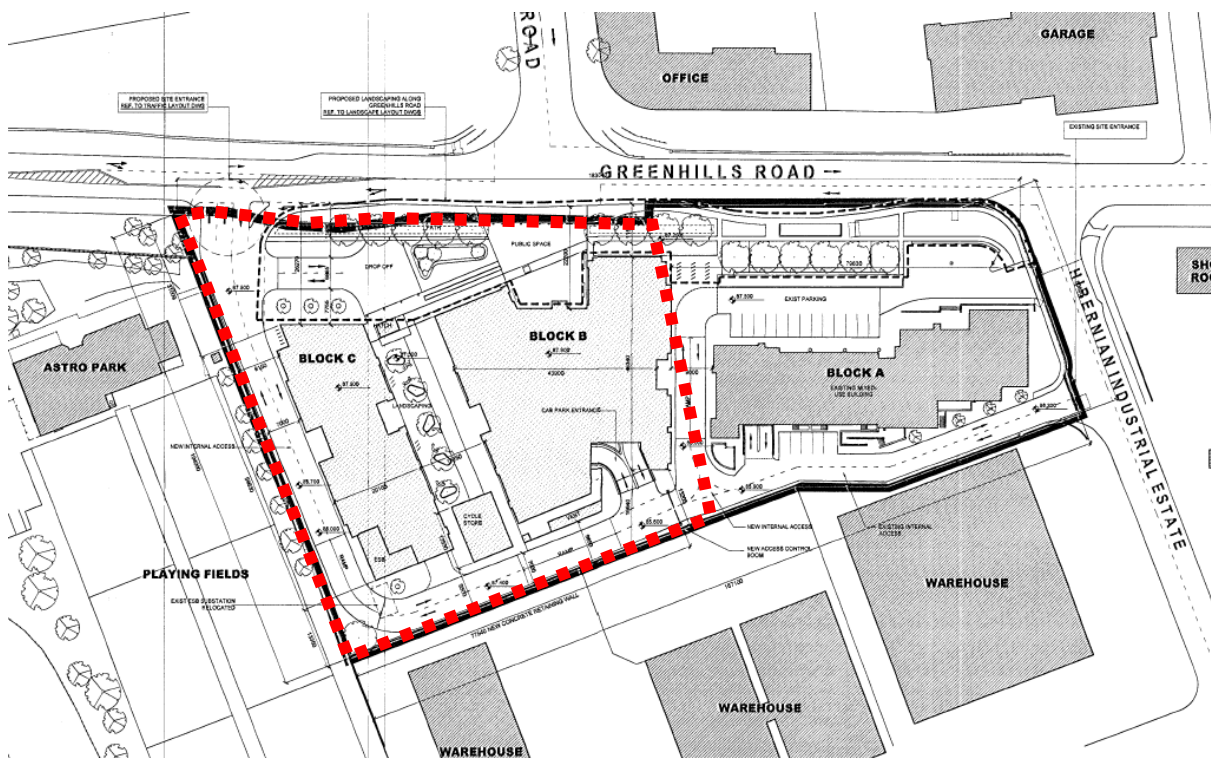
Site plan of development approved under Reg. Ref. SD07A/0622 (subject site outlined in red).
